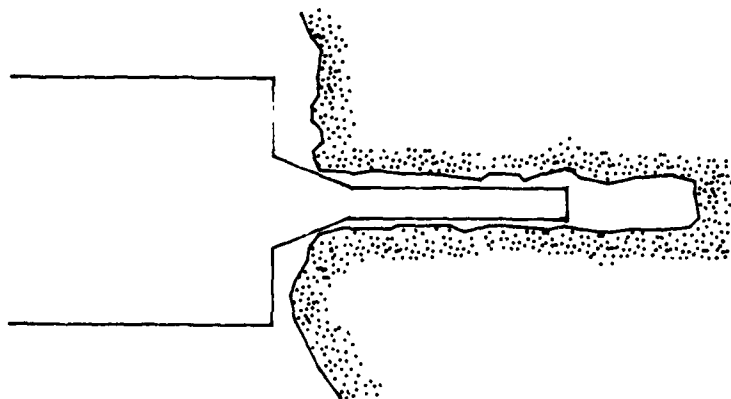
Taper Seal Arrangement for Proposed HYDREX Tool
